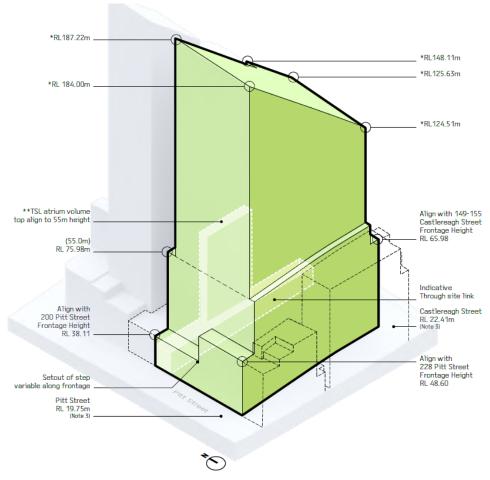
Building Envelope – South Western Perspective Source: 3XN
